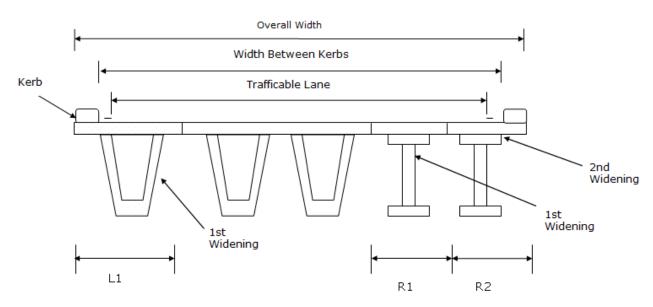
Bridge widths (superstructure only)
